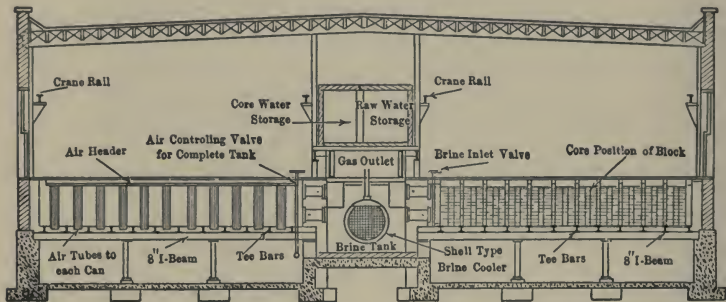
A. Cross section through tank room. [Note compact arrangement, but additional elevation required]
